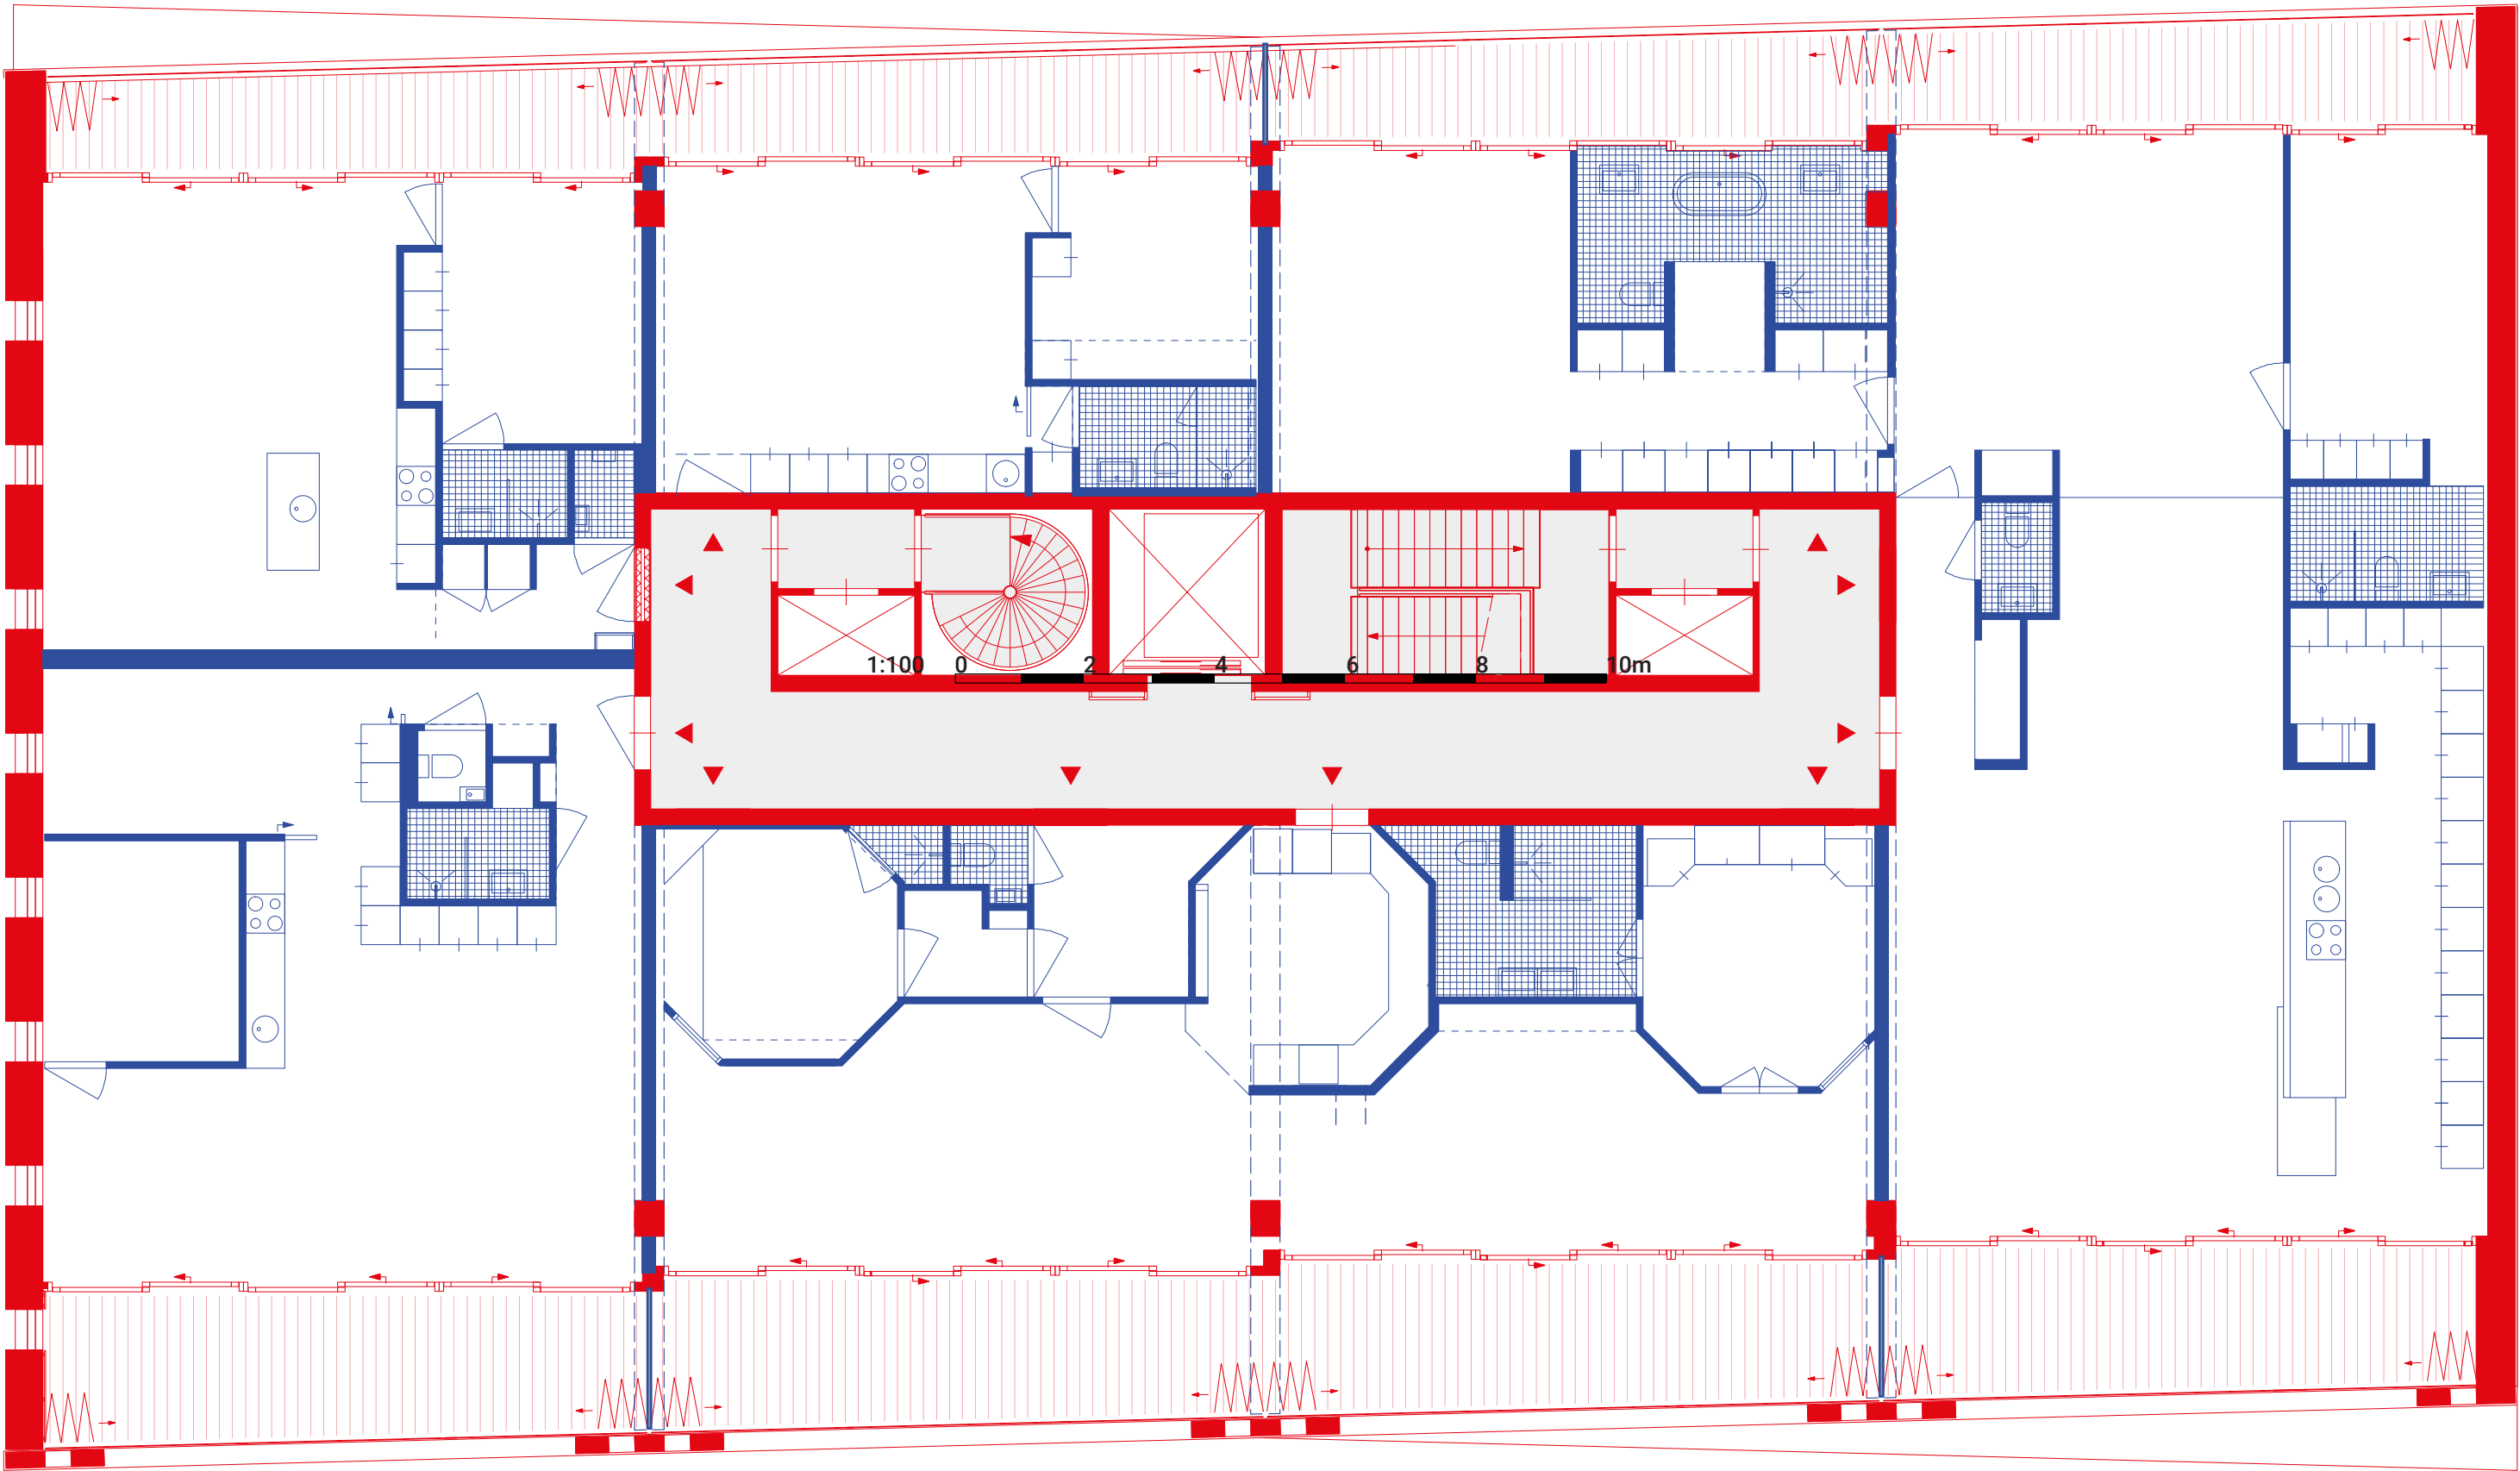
Support and Infill elements within 5th floor highlighted. (Source: Frantzen, 2016; modified by author).
